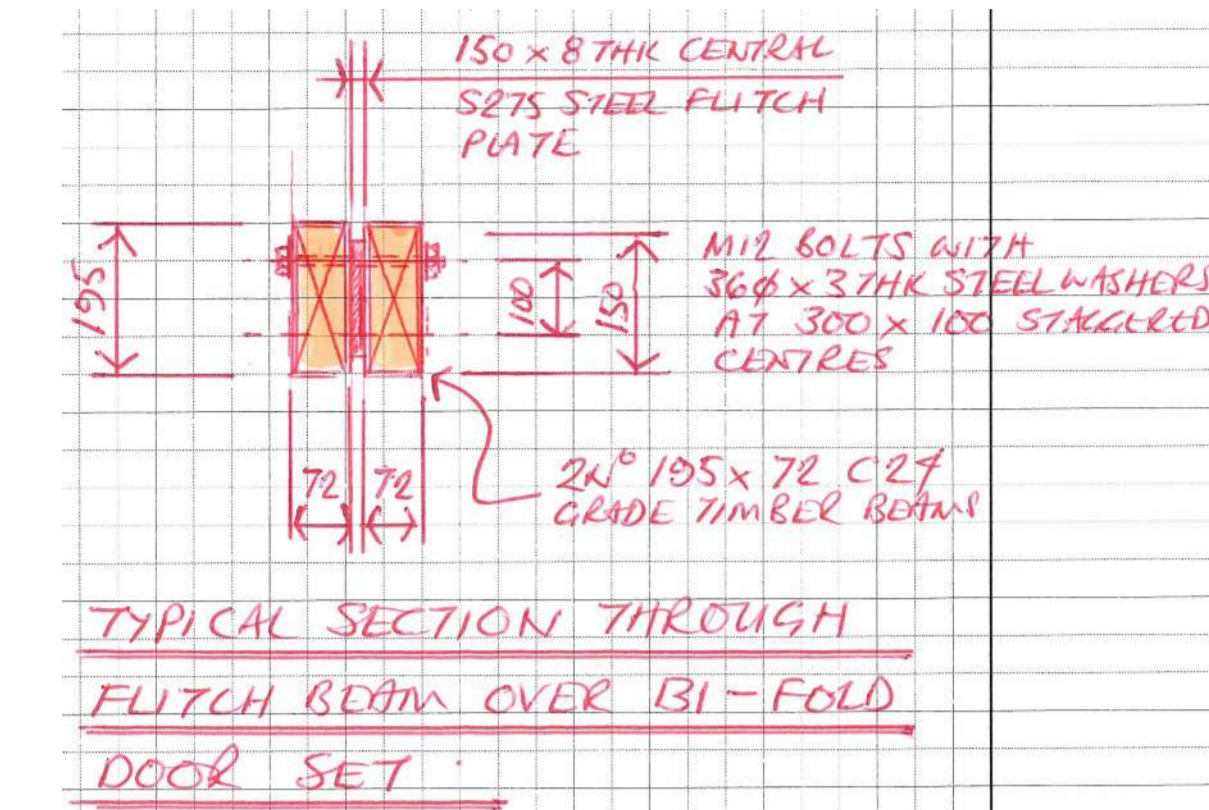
DETAILS OF 'FLITCH' PLATE STRENGTHENING REQUIRE TO EXISTING MAIN CROSS BEAMS
